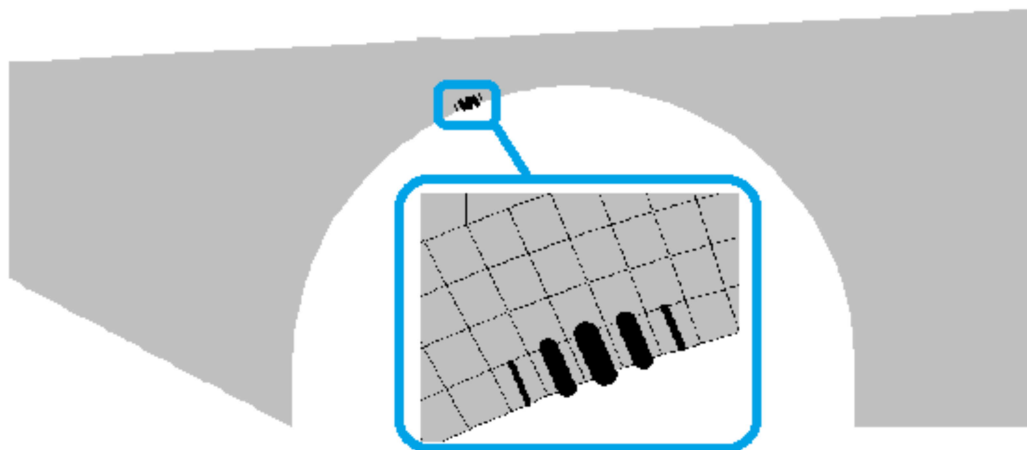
Crack pattern corresponding to the load of 0.203 MN
